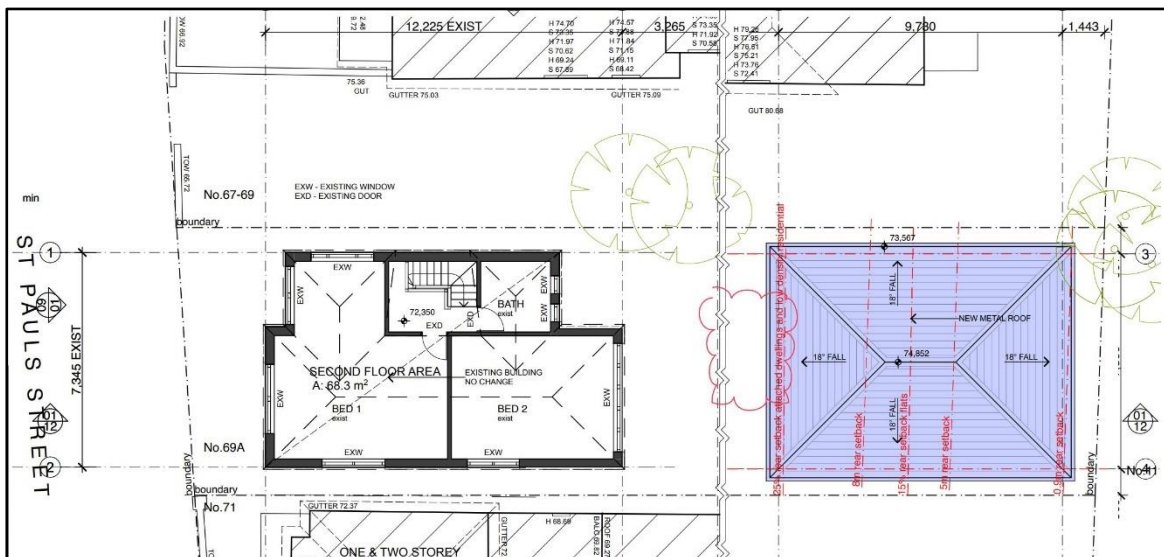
Second Floor Plan & Secondary Dwelling Roof (Rev B), 2/11/2023 (Fortey & Grant Architecture)
